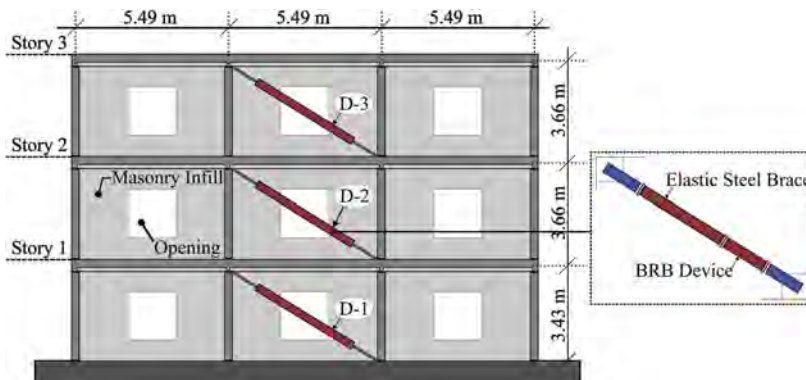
Case study infilled frame layout and placement of the dissipative braces.
